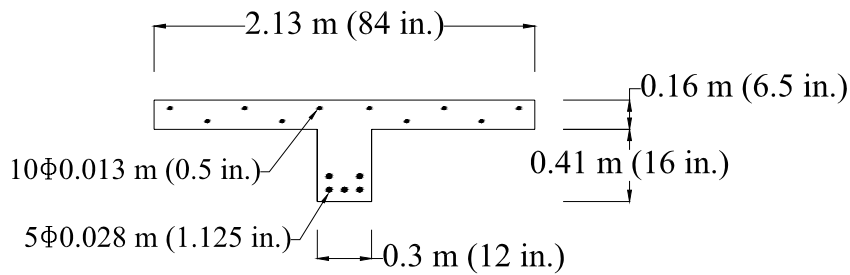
Slab and beam cross section assumed in the hand calculations.
